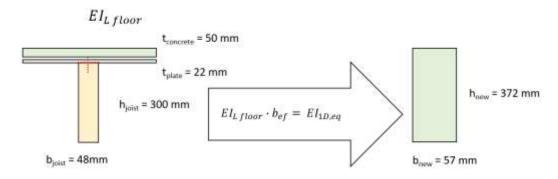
Transformation of a timber joist floor with 50mm concrete screed into concrete beam.
